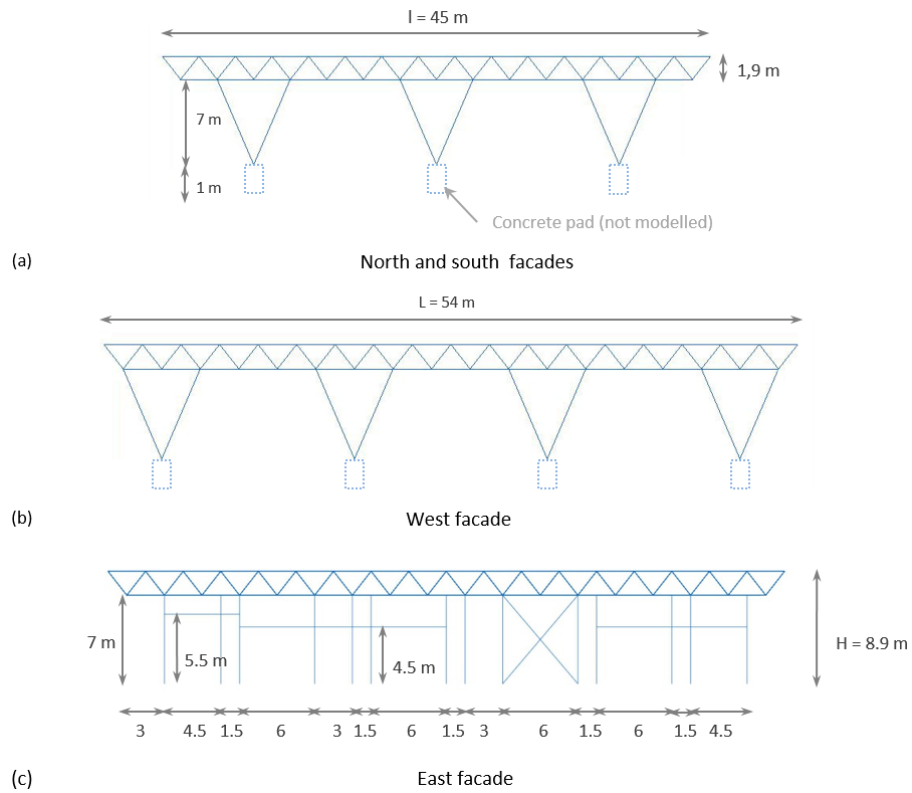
Sketches showing the geometrical details (size and shape) of the metallic structure of every facade of the Irstea Cévennes building.
